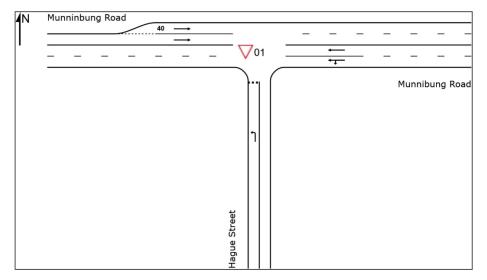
Proposed priority intersection layout for Munibung Road/Hague Street
